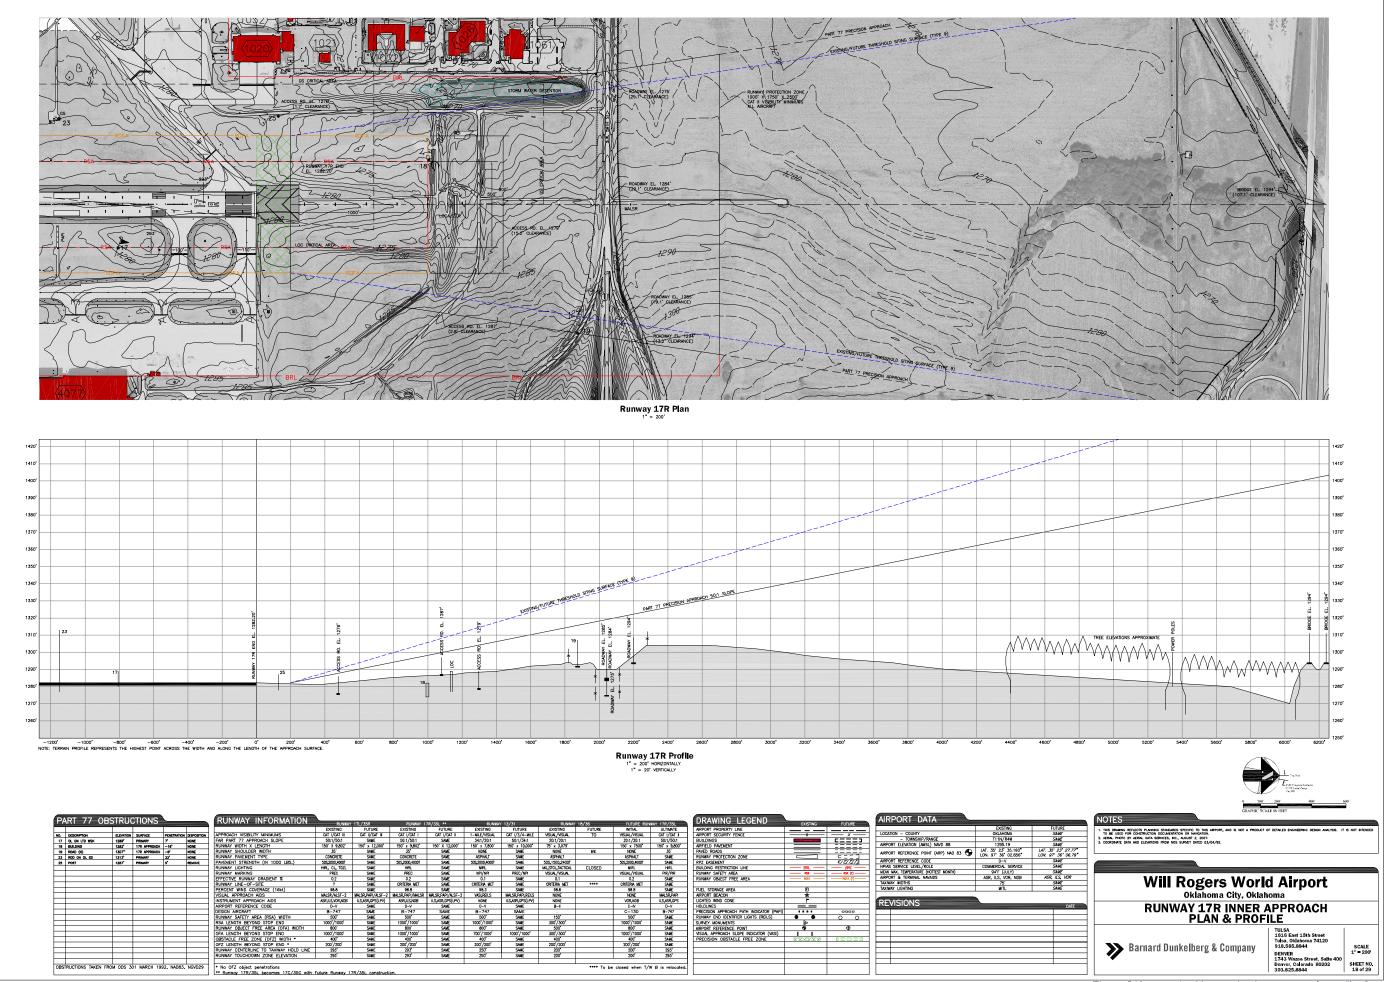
Inner Portion of the Approach Surface - Runway 17R Plan & Profile G.29
